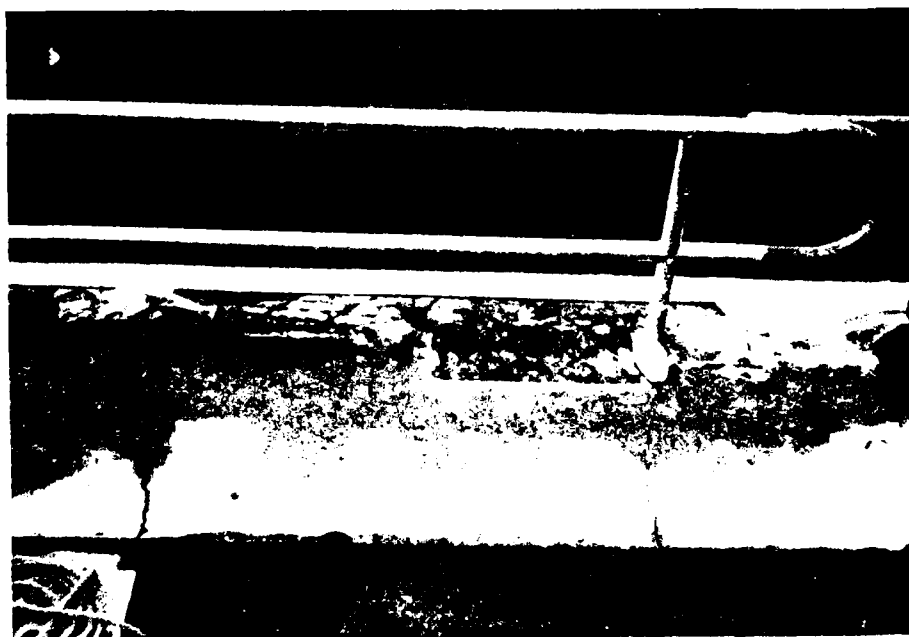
Typical delamination of epoxy overlay, May 1985, Marseilles Lock.
